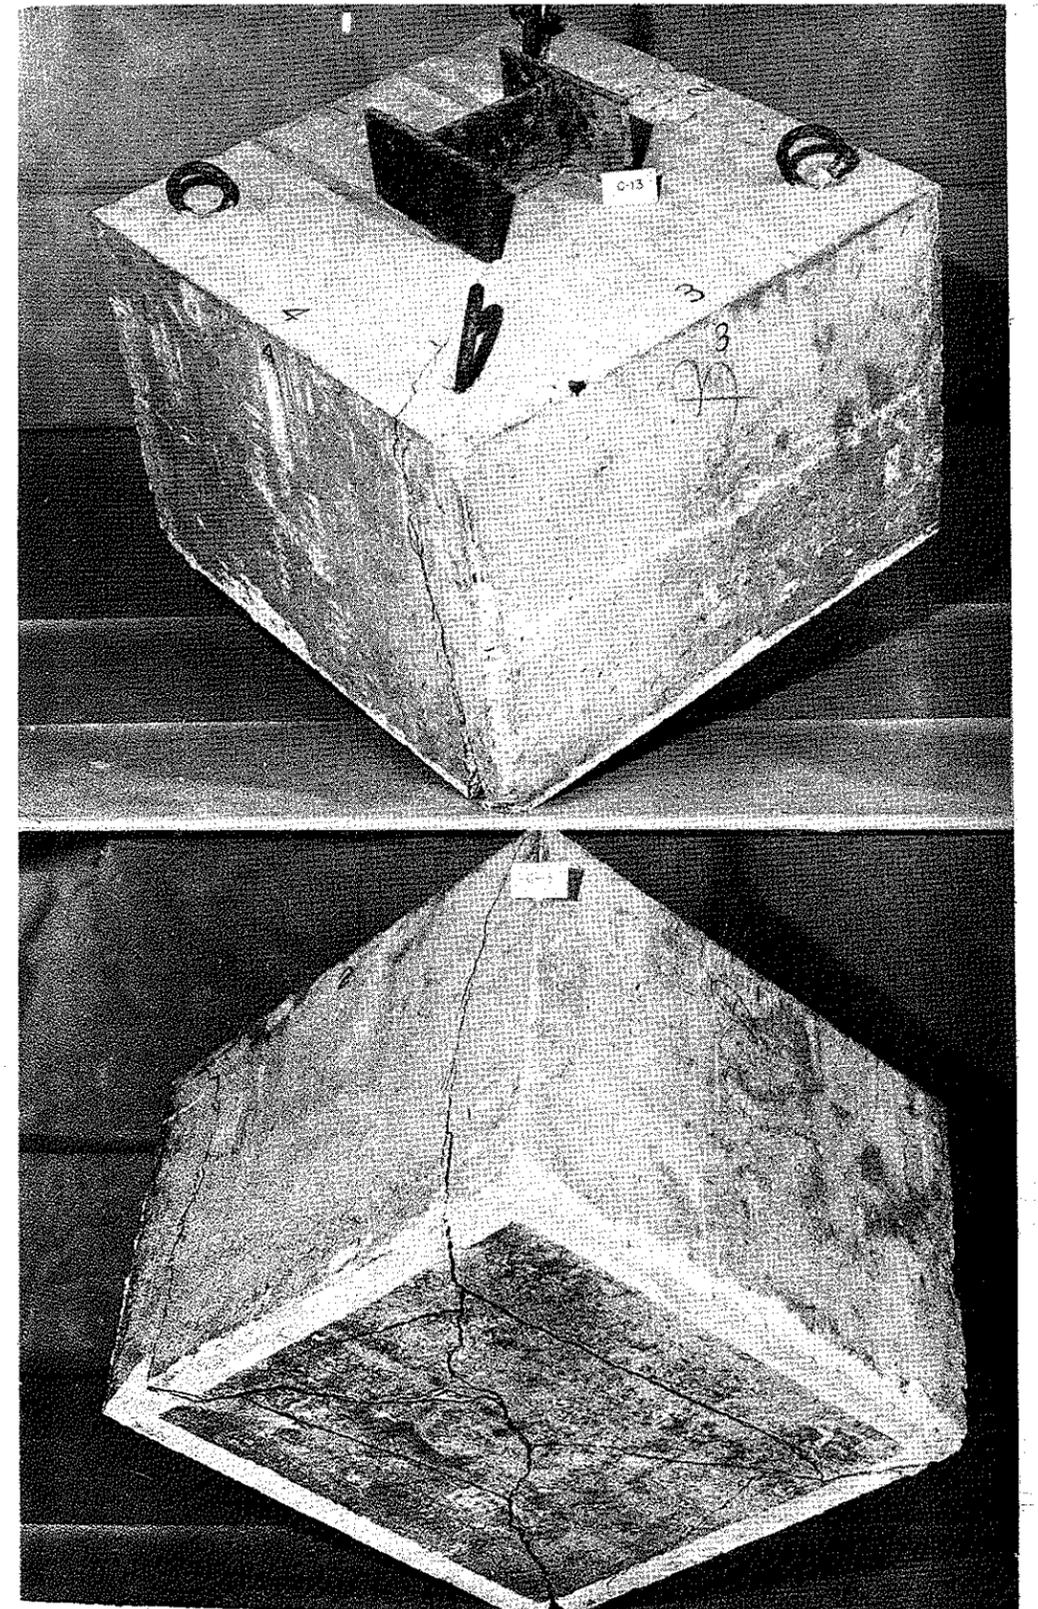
APPEARANCE OF SPECIMEN C-13 AFTER TESTING.
